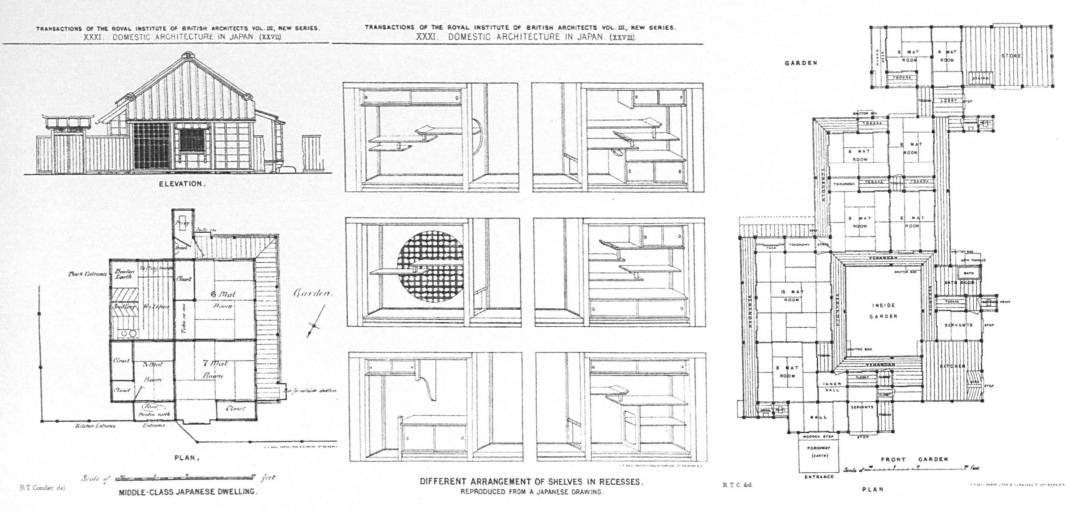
Elevation and plan of a middle class house. Fig. 31 Detailed drawings of shelving beside tokonoma. Fig. 32 Plan showing modular nature of Japanese house. Josiah Conder - Illustrations from 'Domestic Architecture in Japan'
